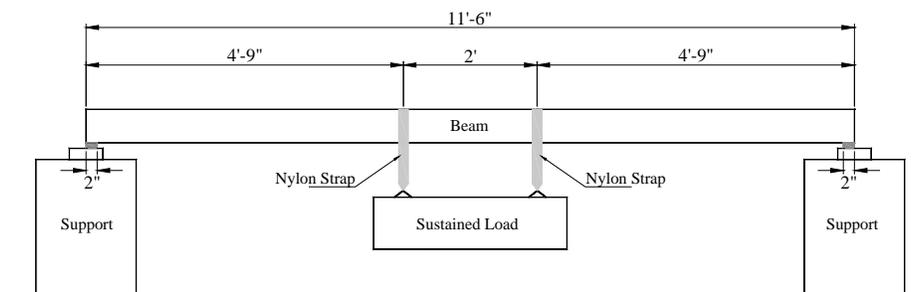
Peterman Bond Test layout (recreated from (Peterman, 2009))
